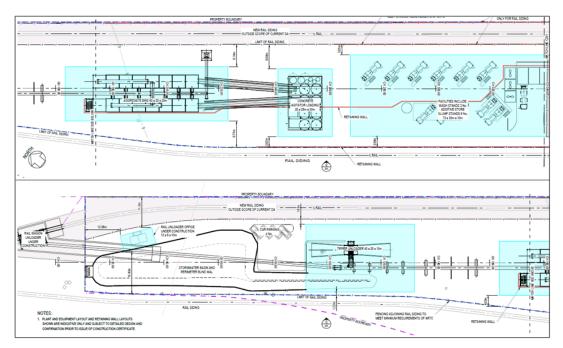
Stage 2 Site Plan extract – centre and rear of the site
